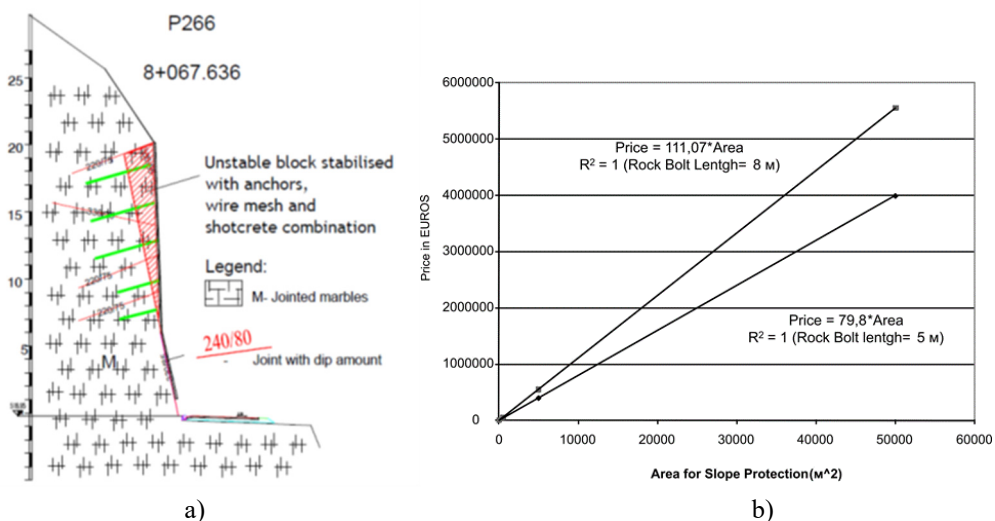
a) Typical section for repair solution of rockfall zones along access road to arch dam Sveta Petka; b) Cost estimation for Slope Protection Type for different rock bolt length.
